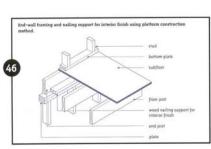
Critical structural details: end wall framing (Source: CMHC 2001)
